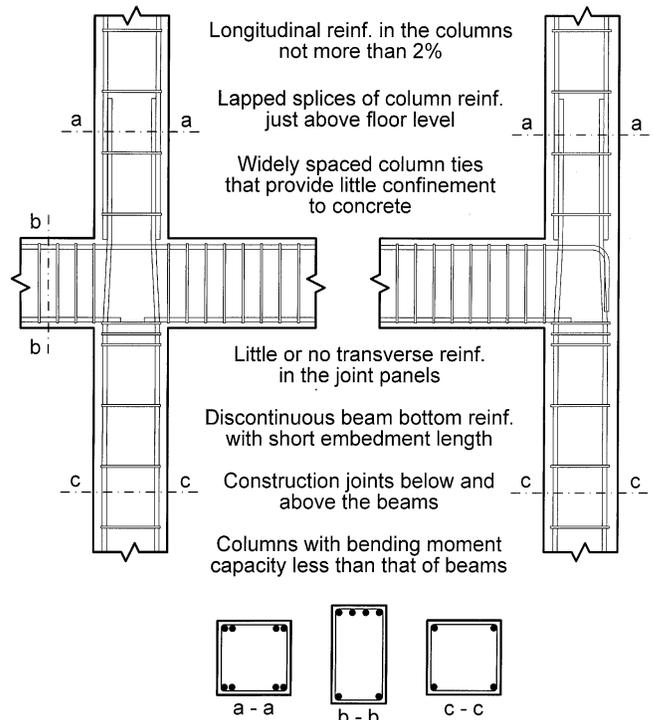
Typical details in lightly reinforced concrete structures identified by Beres et al.³
